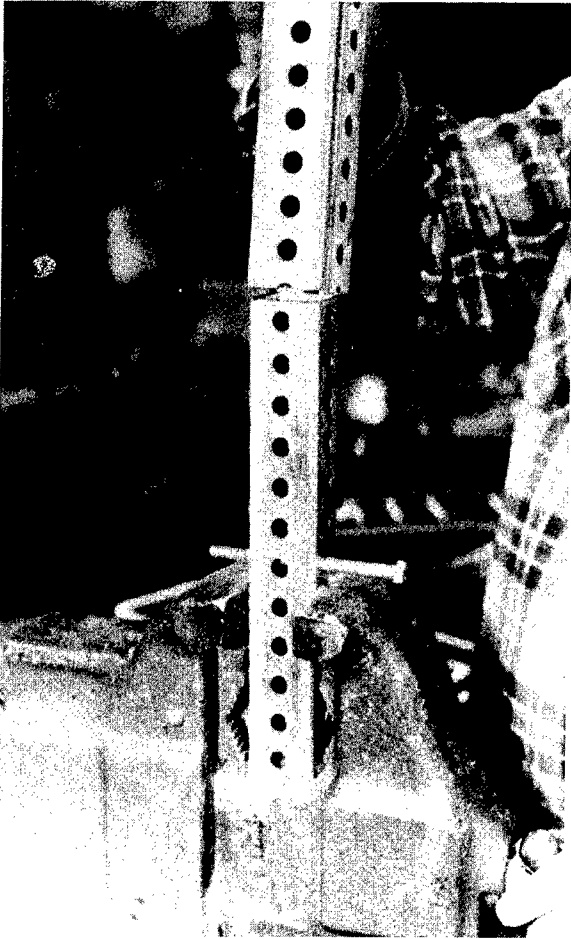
Pin prevents larger tube from slipping completely over the smaller tube.
